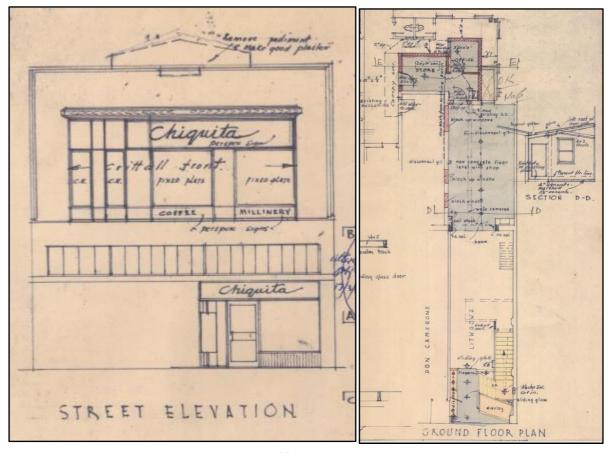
Details from 1960 plans of the building at 30 Tay Street for Lithgow's footwear limited, showing alterations to the building's street frontage (left) and ground floor plan (right) (Milne, 1960).
